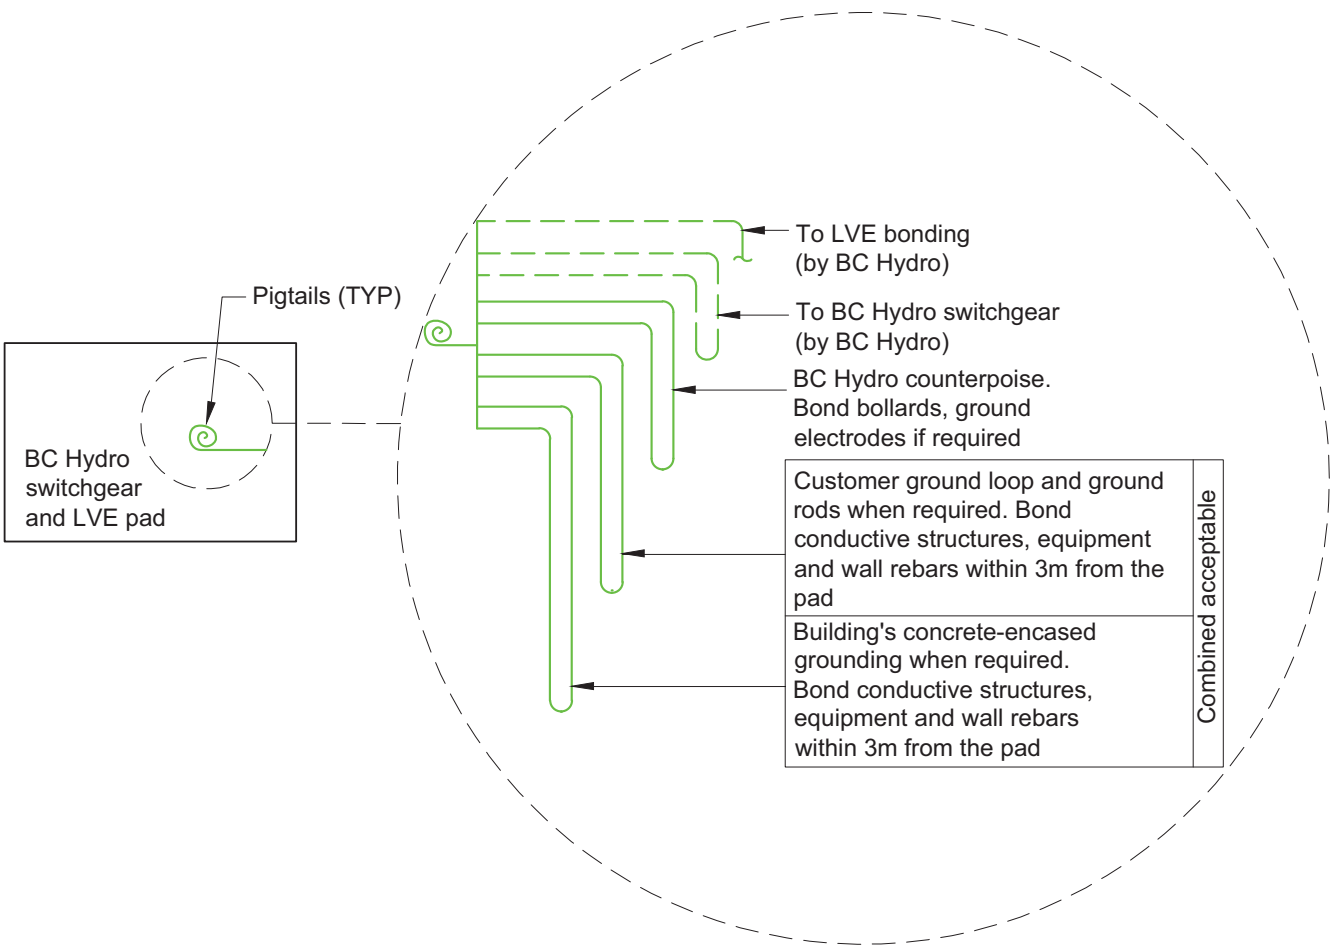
Grounding and bonding schematics for installation on suitable backfill outside building footprint on private property
